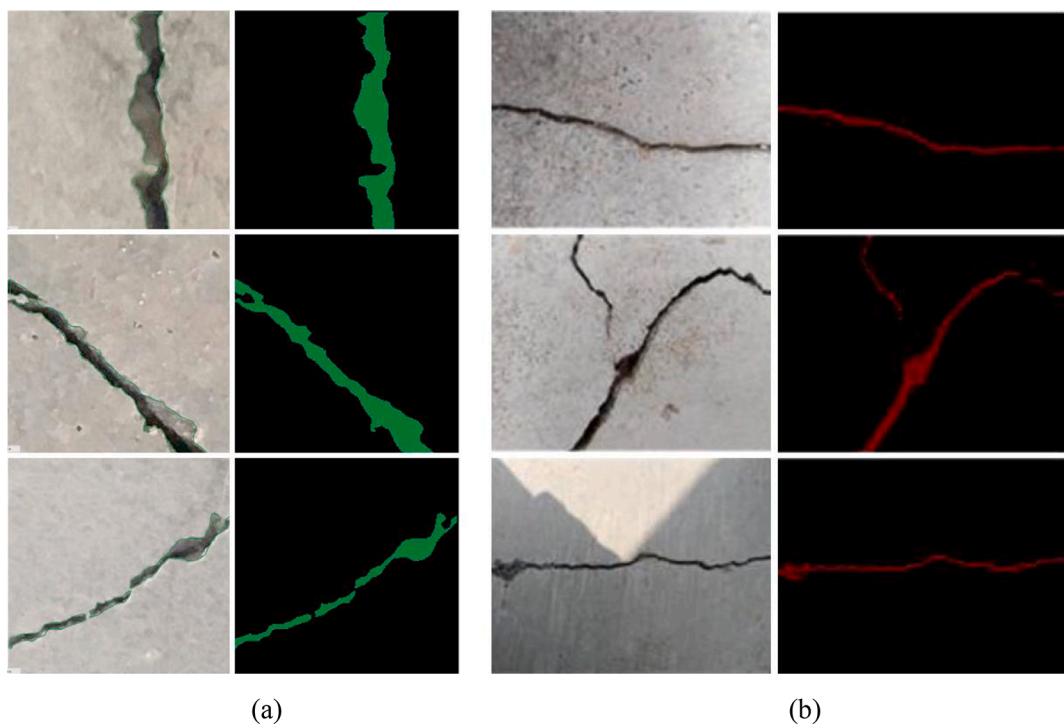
Concrete crack predicted by (a) Dung and Anh [324] and (b) Li et al. [325].
